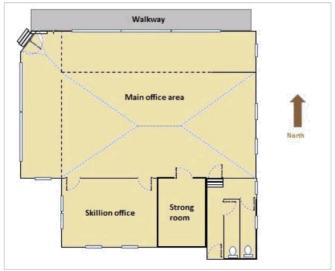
Internal floor plan (AHS 2016) [dotted lines show removed verandah walls]
